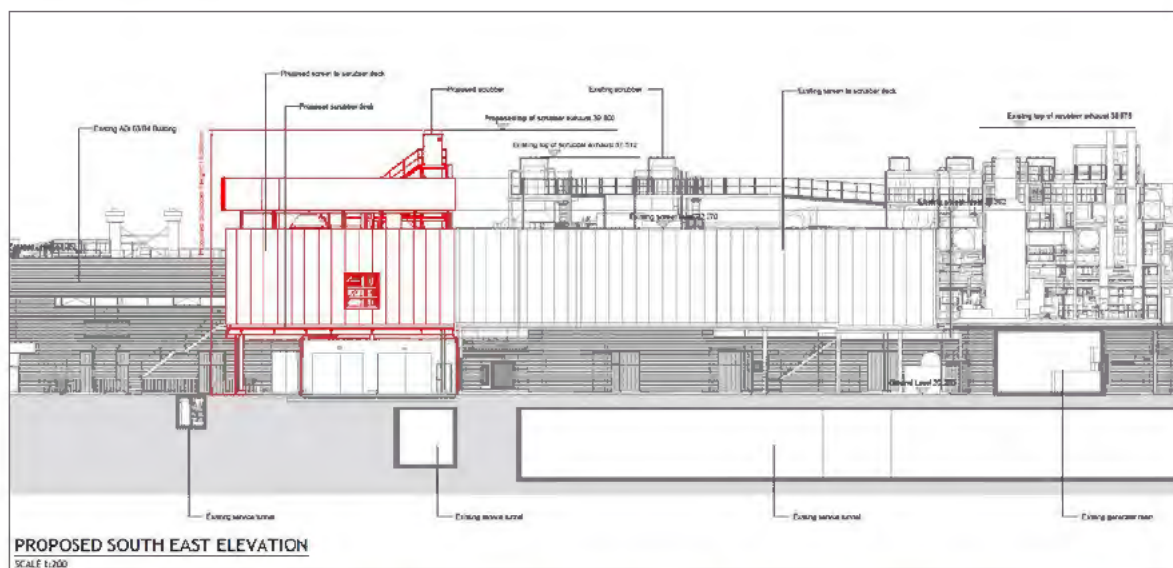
Elevation showing Existing Plant (top level 39.675m) the Proposed Plant (top level 39.500m)
